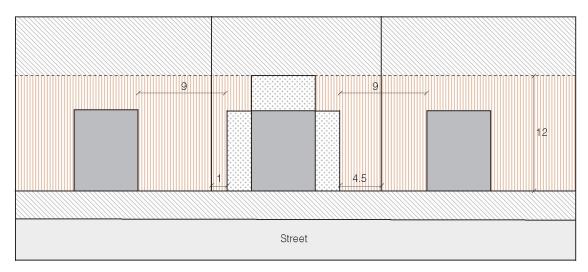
Detail plan of the neighbourhood of Bräcke (© Bräcke, Sävenäs och Utby, 2021)
